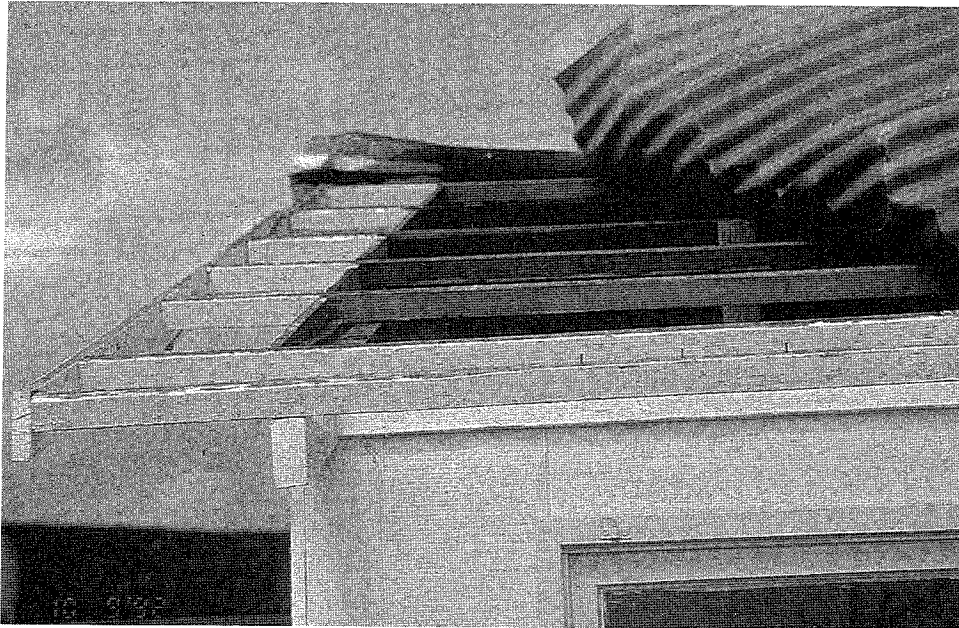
Steel roofing torn from the roof of a single-wall home. The wood purlins often went with the roofing.
